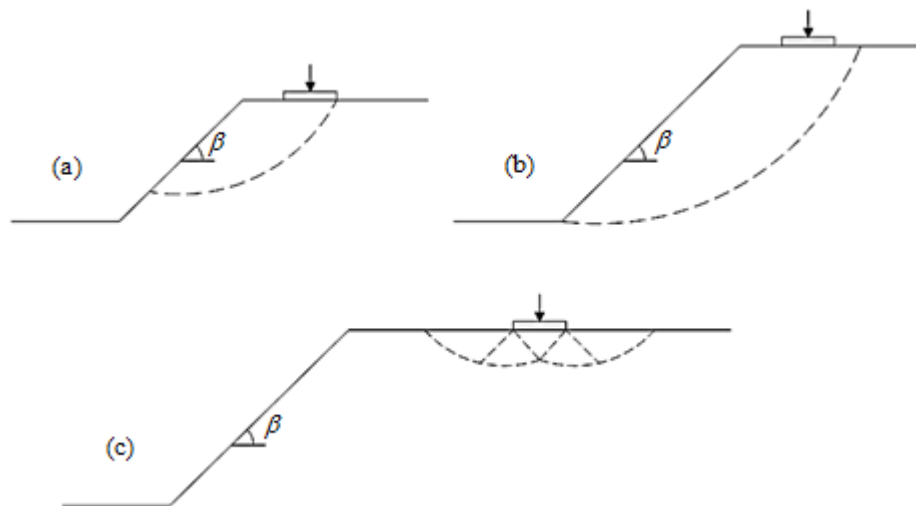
Different typical failure modes for footing-on-slope problem: bearing capacity failure (a, c) and overall slope failure (b).
